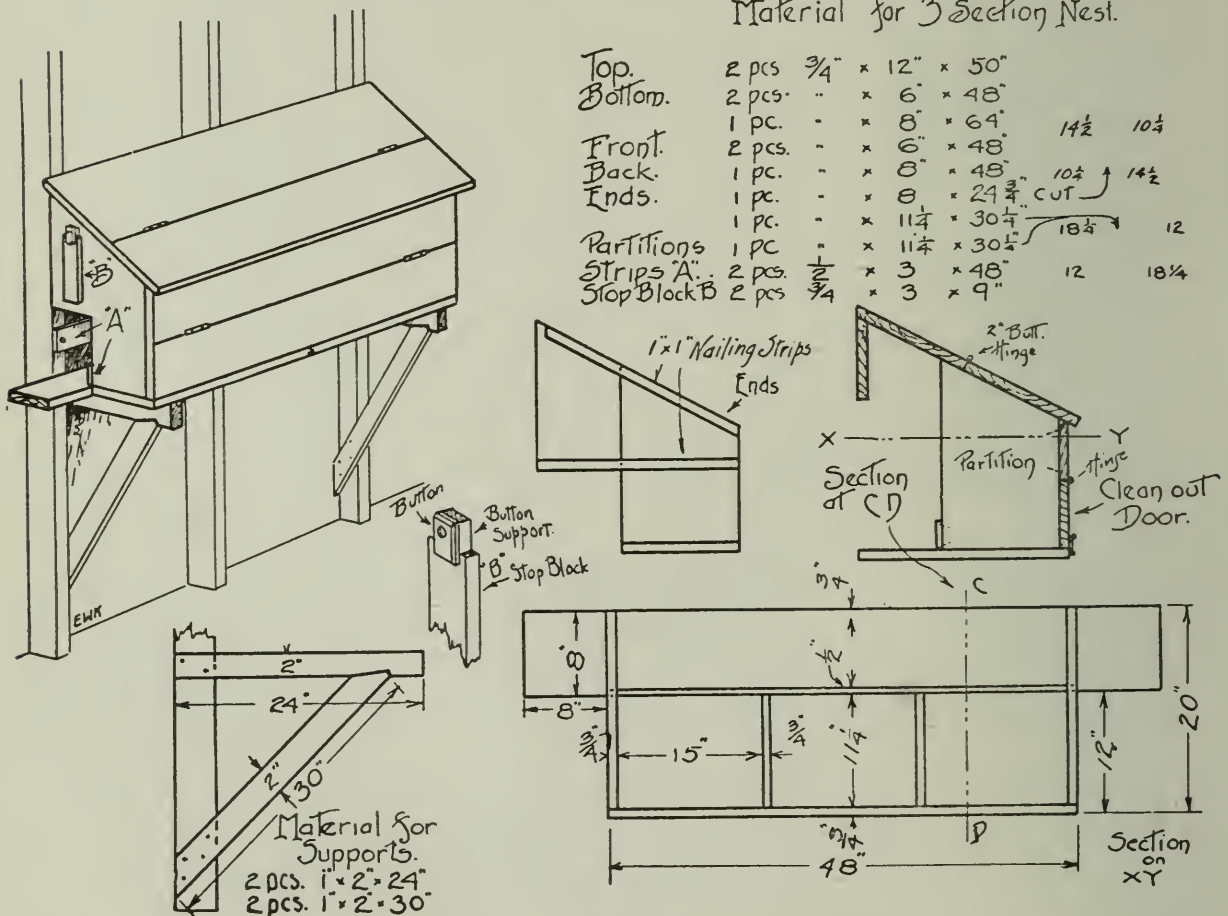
A convenient type of open nest which may be supported upon brackets on the wall, allowing free use of floor space for the hens.
